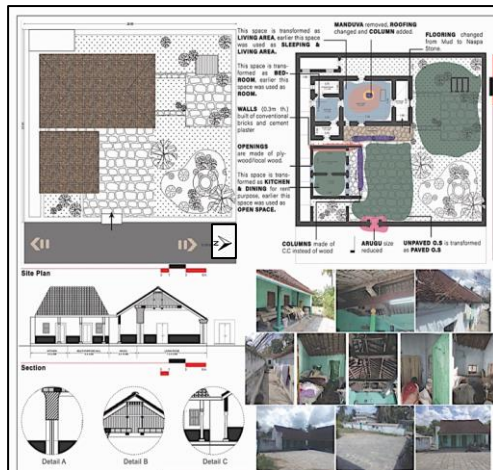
Plan, Site Plan, Section and transformations of House no. 14;
